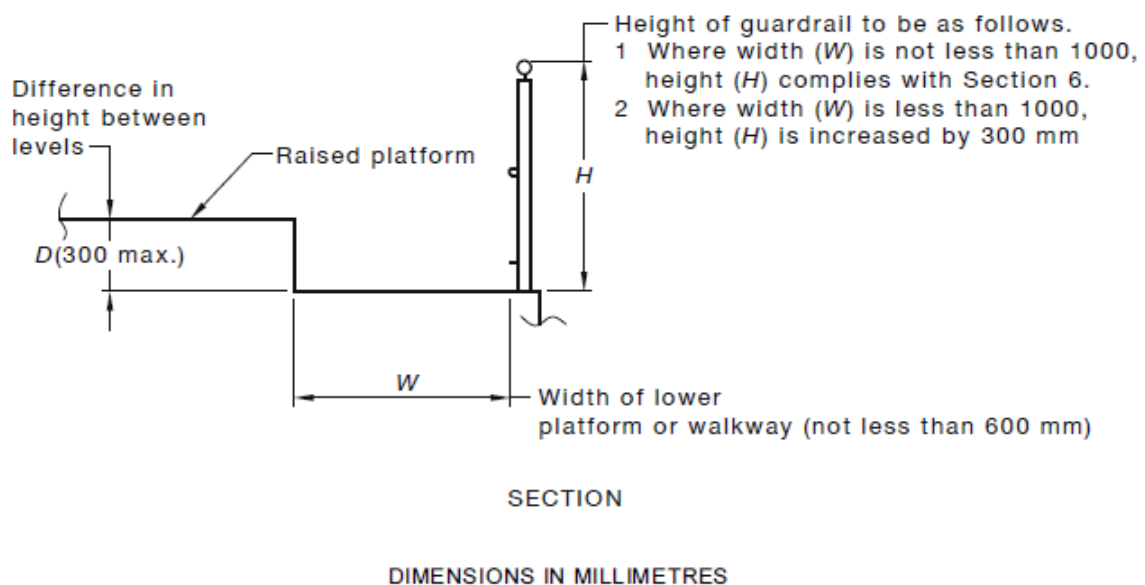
GUARDRAILS ON PLATFORMS
